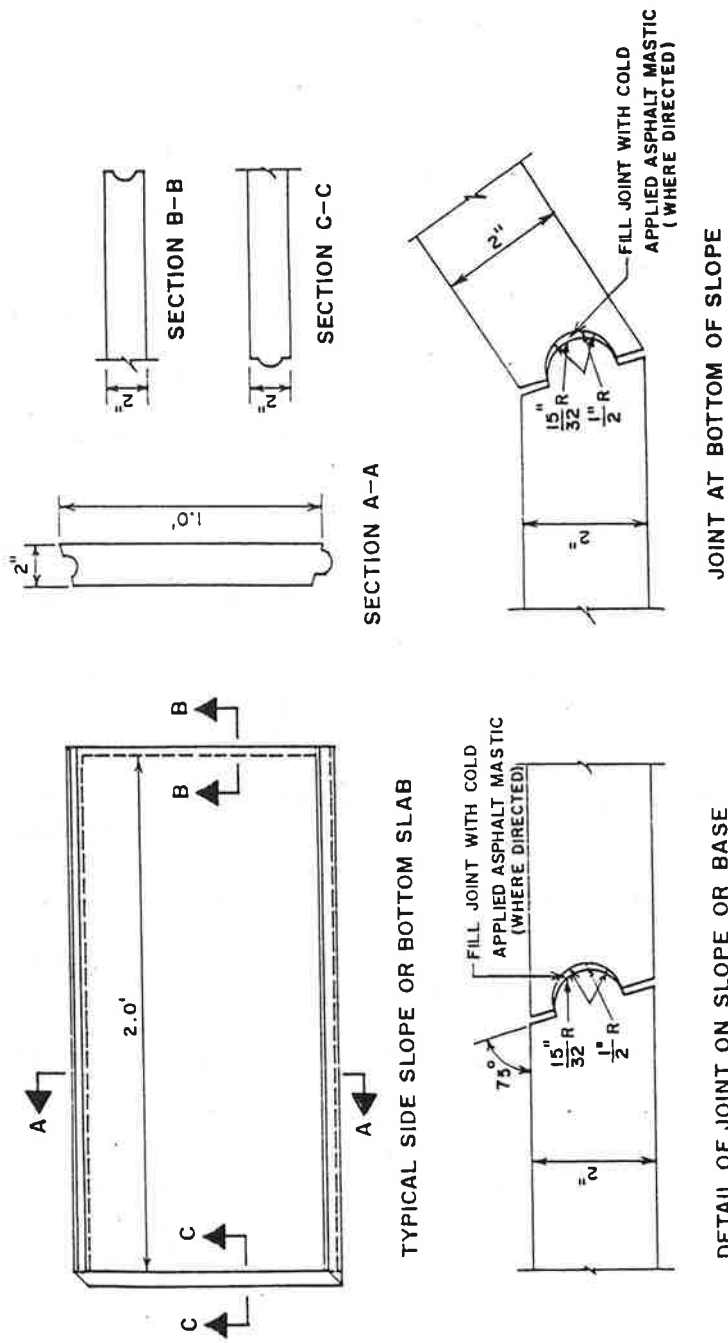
Precast Concrete Slab Unit - Typical Detail.
